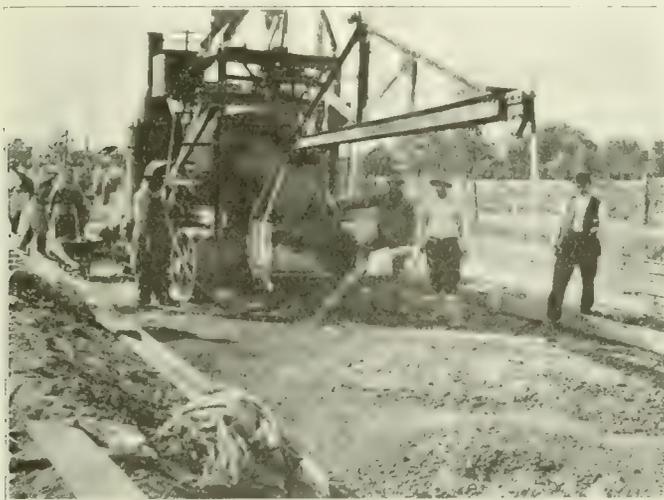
Sprinkling Subgrade Preparatory to Placing Concrete. Note Side Forms in Place.
